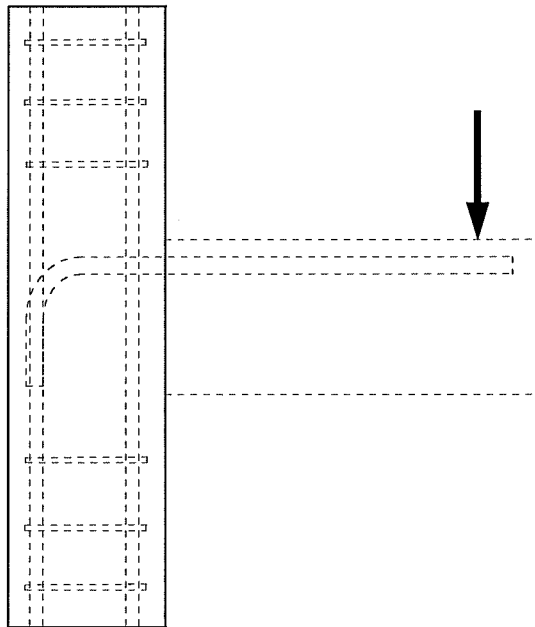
Exterior Joint used by Marques and Jirsa [9] for testing Hooked Bar Anchorages
